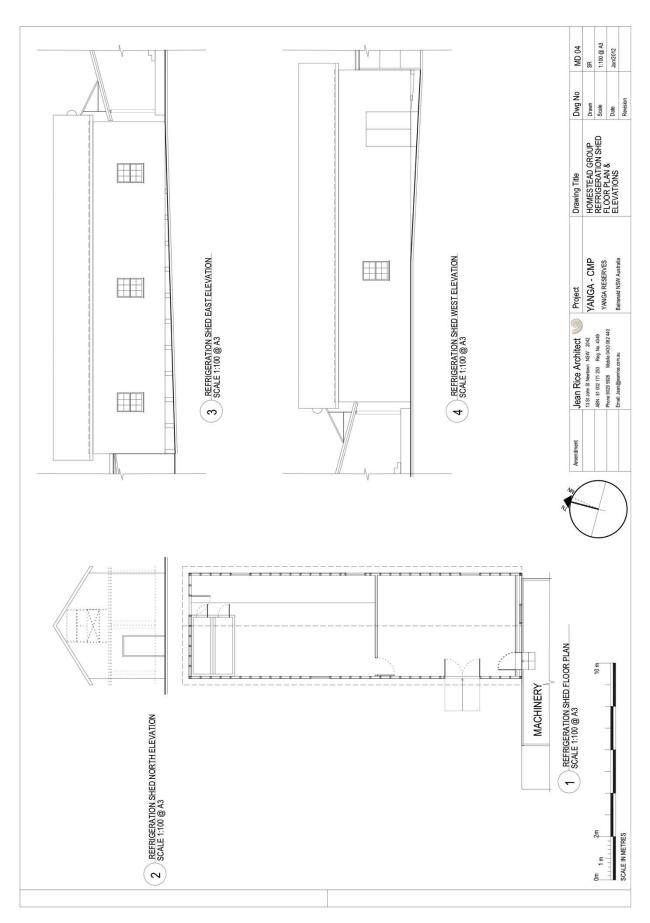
Homestead Group Refrigeration Shed floor plan & elevations and elevations. Jean Rice Architect, site assessment 2009.
